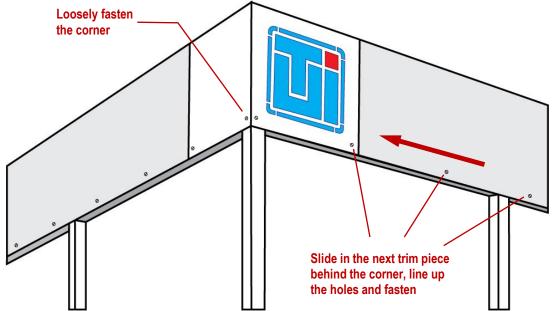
Loosely fasten all corner trimming in place and then slide the long trim sections underneath the corners until the holes align
